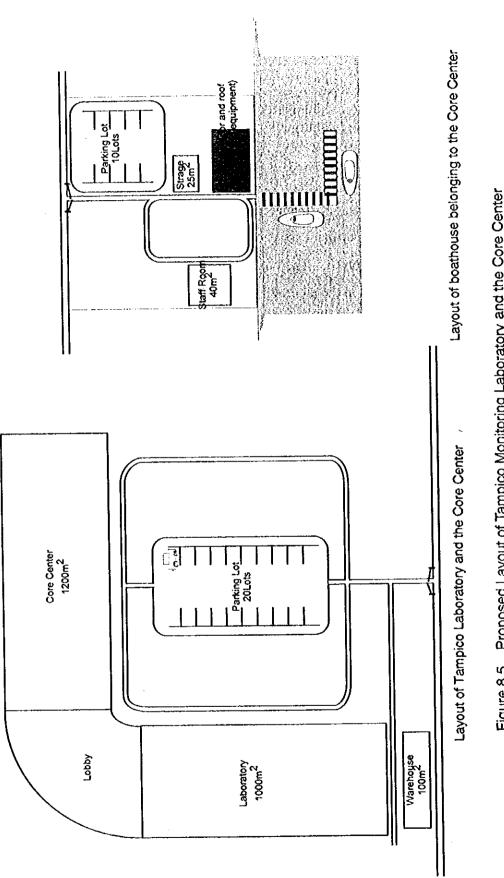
Proposed Layout of Tampico Monitoring Laboratory and the Core Center
